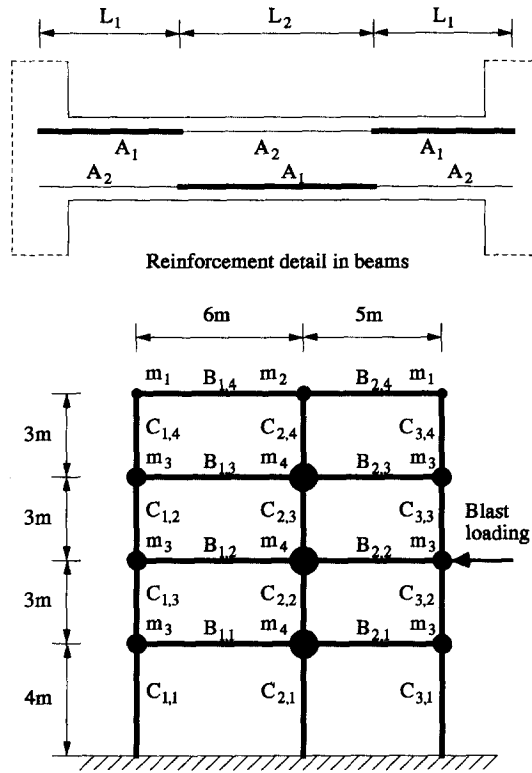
Geometric configuration and loading of reinforced concrete frame.
